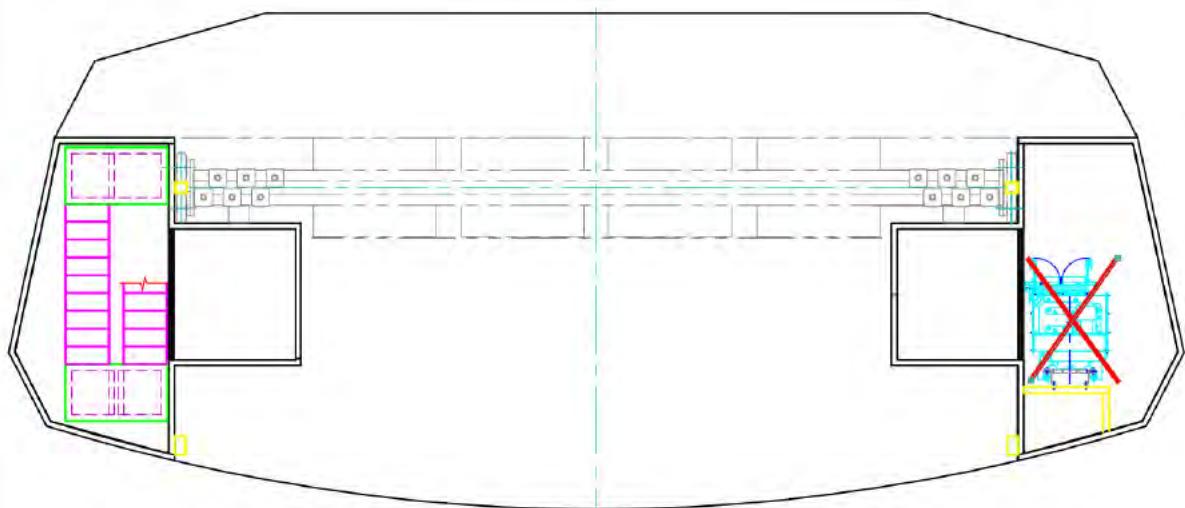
Tower cross-section showing the proposal to remove access elevator located inside the tower
